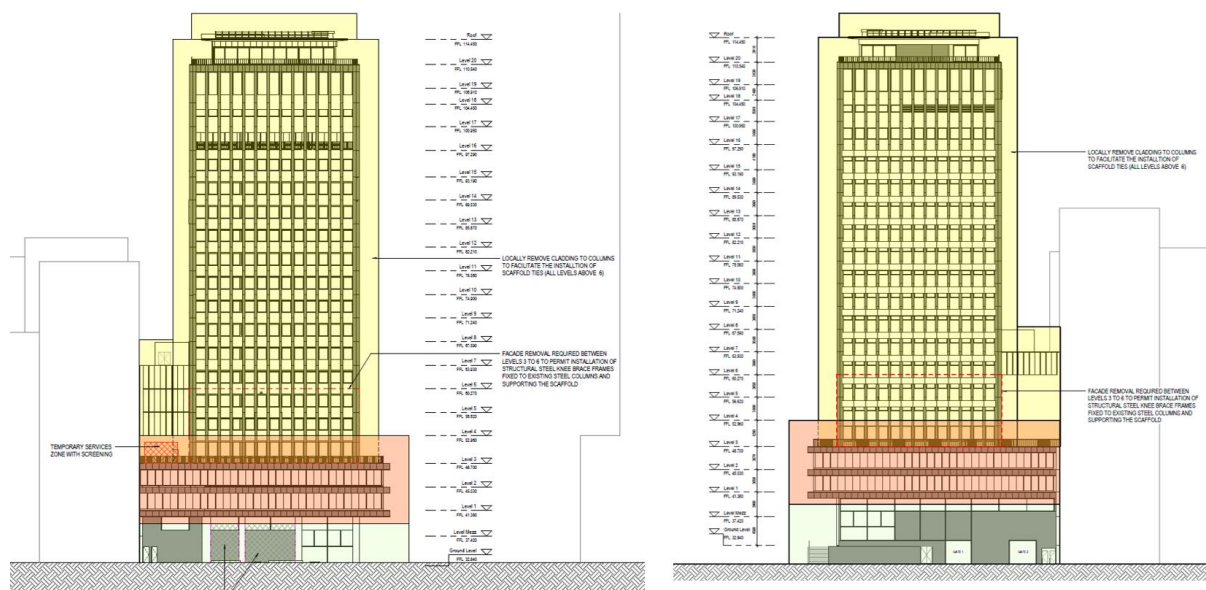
Macquarie Street (left) and Pitt Street (right) elevations showing hoarding, scaffolding and temporary services zone with screening
